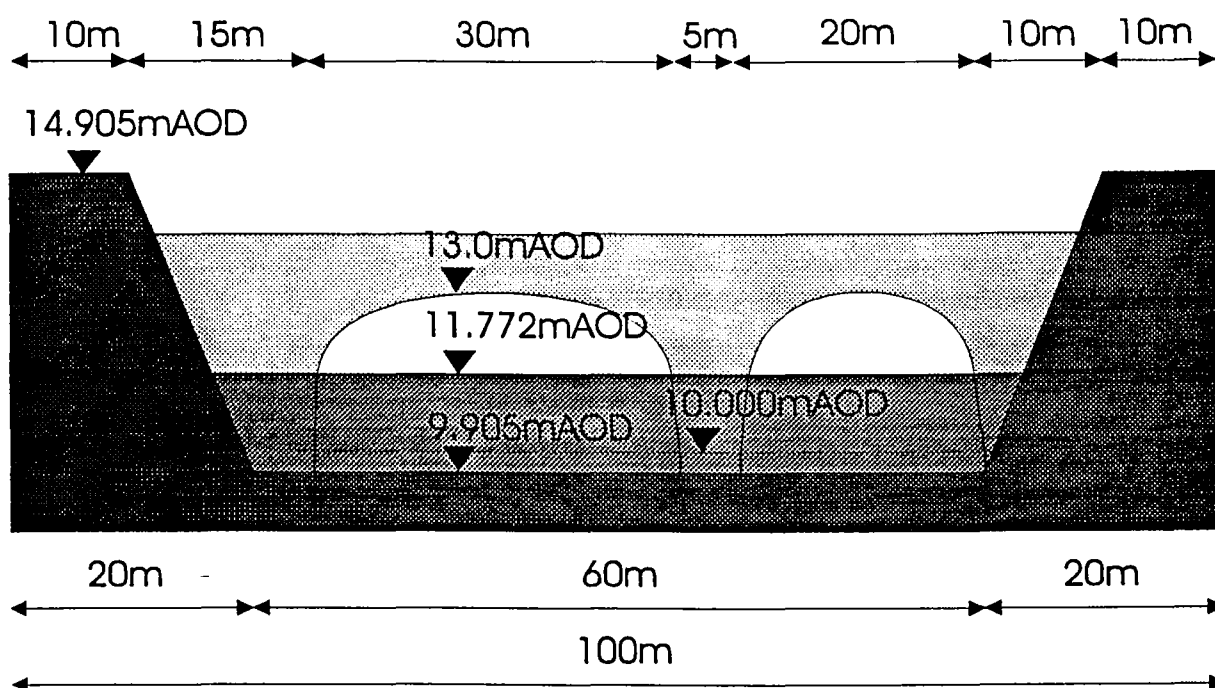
TEST 11 Part B - Arched bridge dimensions
